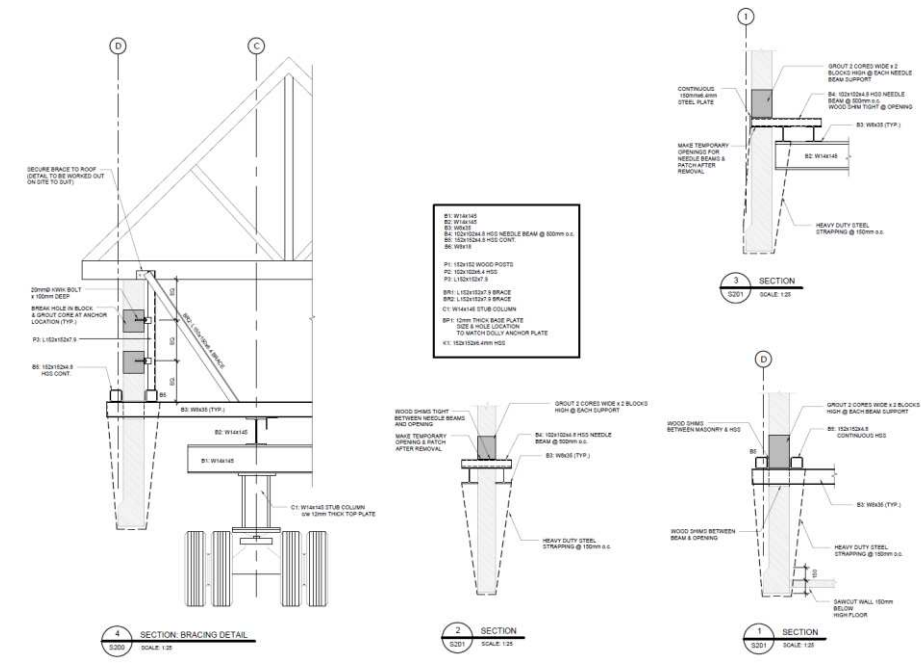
A series of drawings detailing the methodology for stabilizing the block walls by anchoring inserted pins in grout and introducing heavy duty steel strapping. Source: Cleland Jardine Structural Engineers 2022.
